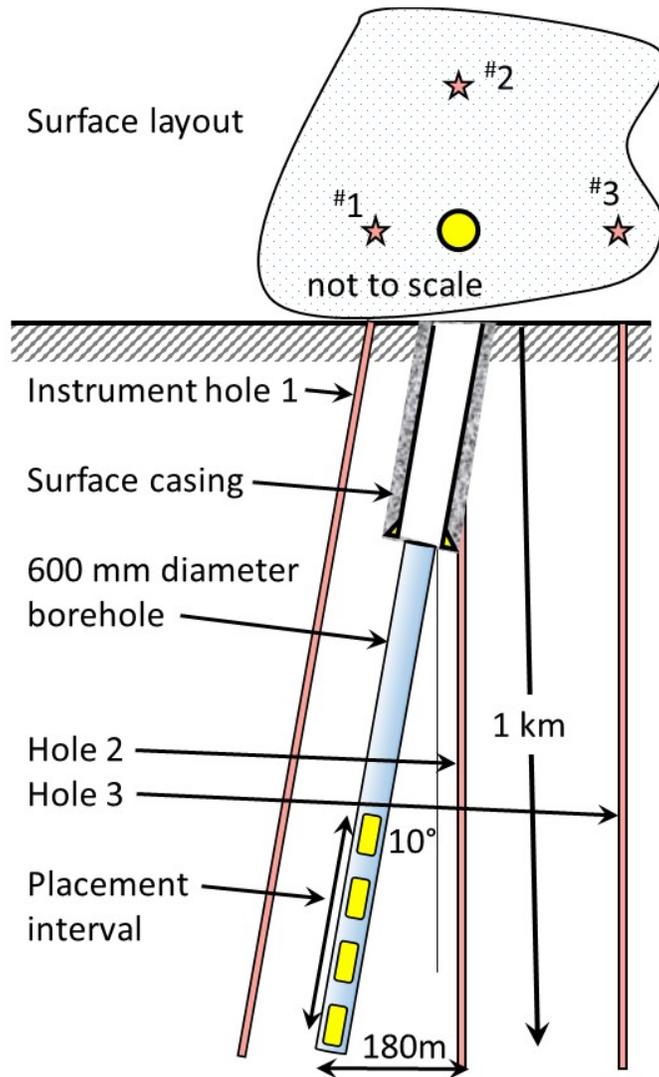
The basic plan and cross-section views of the proposed demonstration site
